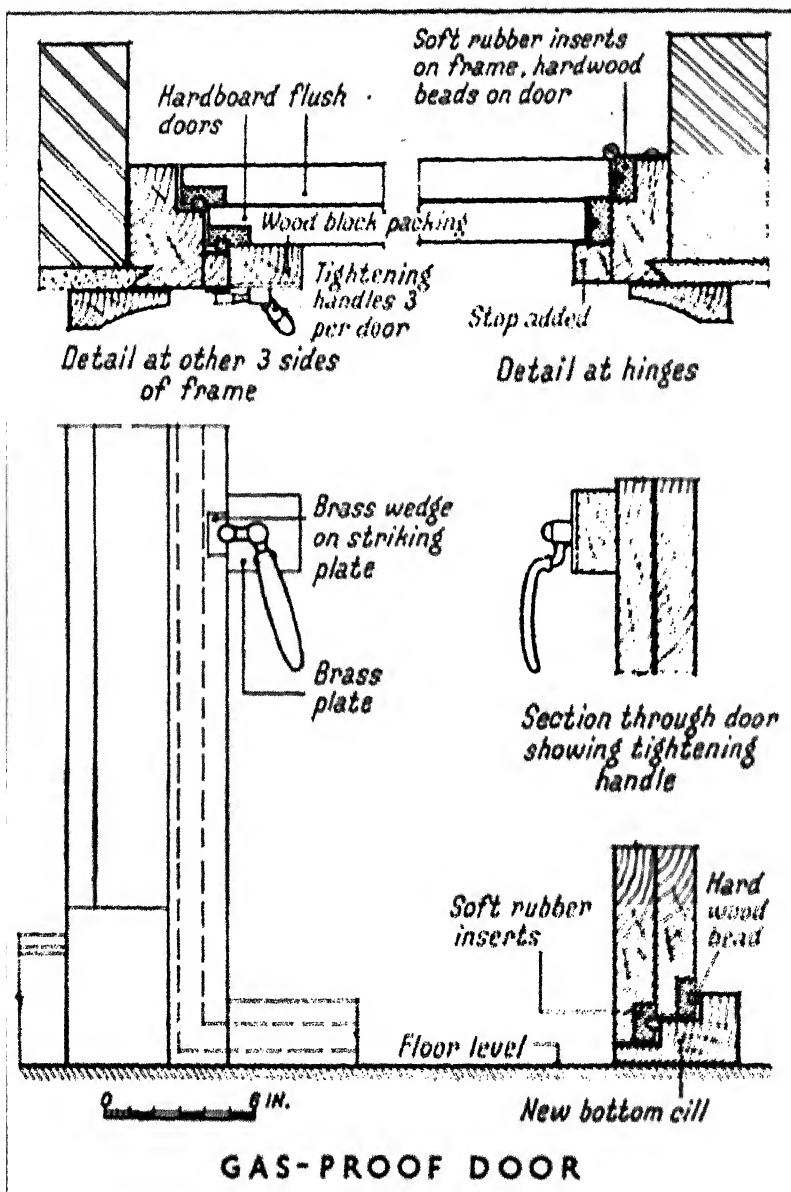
Light type of gas-proof door suitable for refuge within a building.
